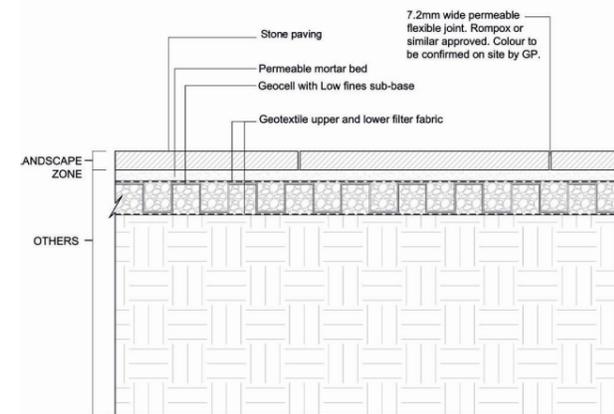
MAIN PATH STONE PAVING TYPICAL DETAIL
